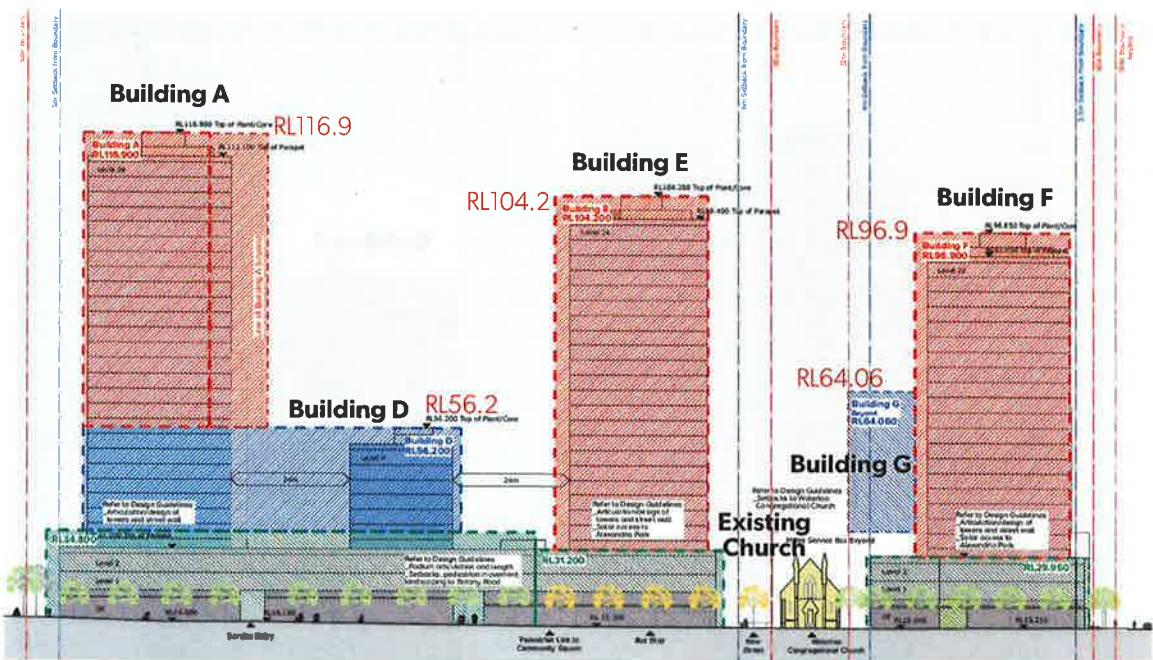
| Building Envelope Elevation Plan – Botany Road (Source: Applicant's RTS)
